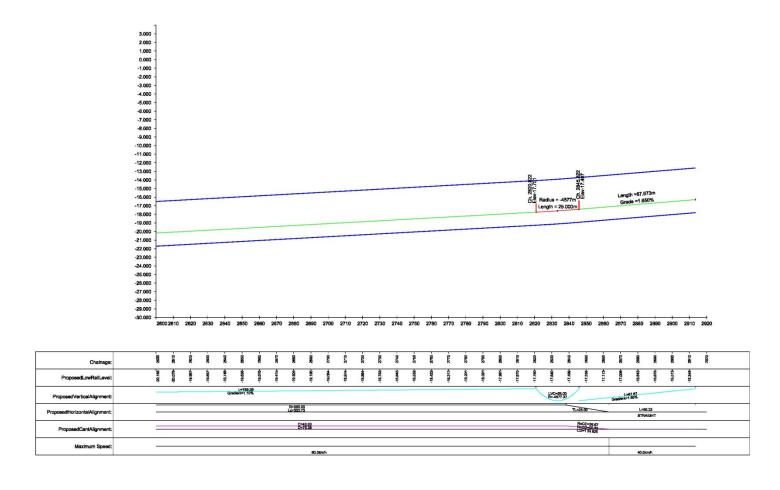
Northbound Horizontal and Vertical Track Alignment Sheet 6
